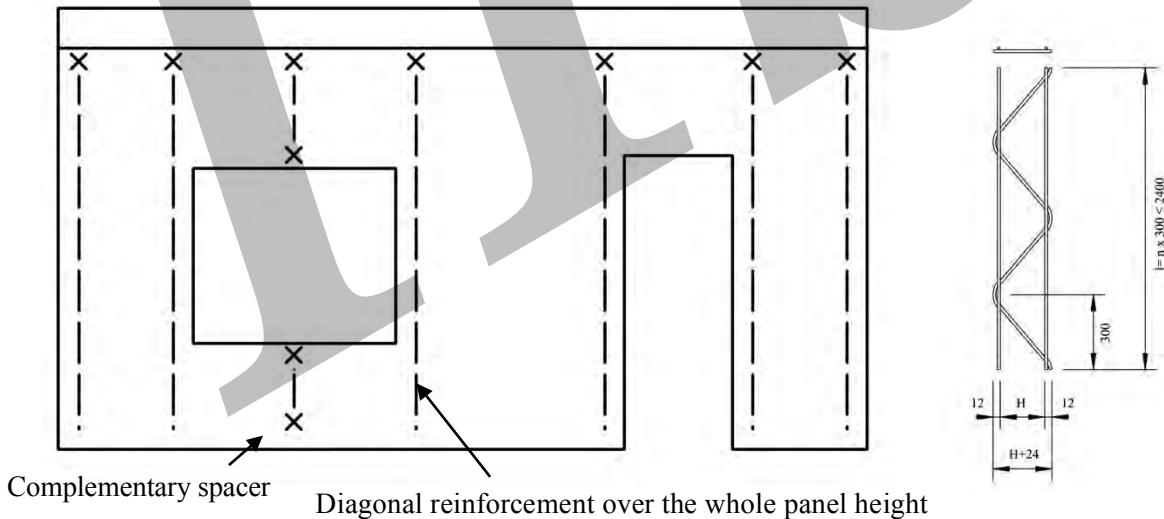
Continuous diagonal fixing of the two leaves of a sandwich panel over the full panel height.
